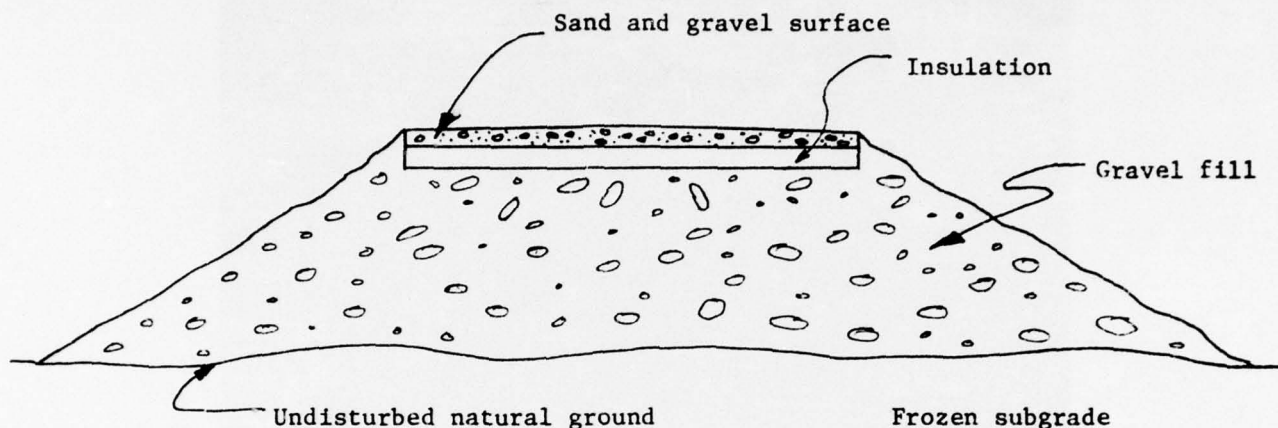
Schematic cross section using foamed insulation in the embankment (not to scale).
